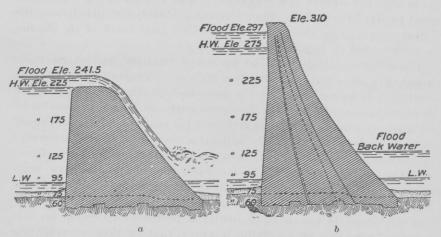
Profile of proposed dam on Salt River. a, first construction; b, completed.
